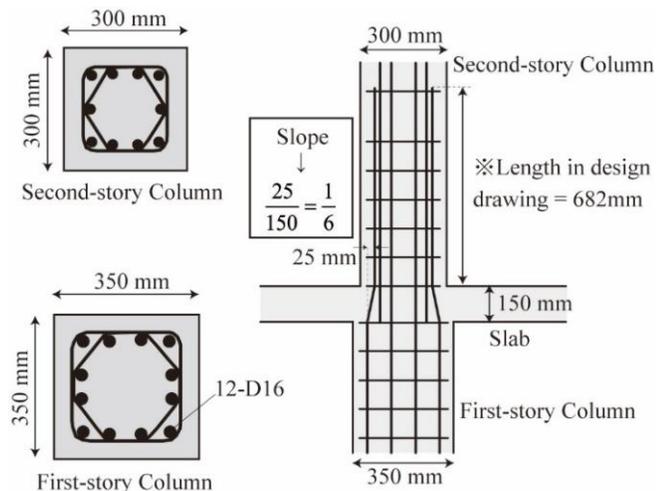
Beam-column joint at X12-Y1 with Class V damage Fig. 6 – Structural details at the joint in Fig. 5
